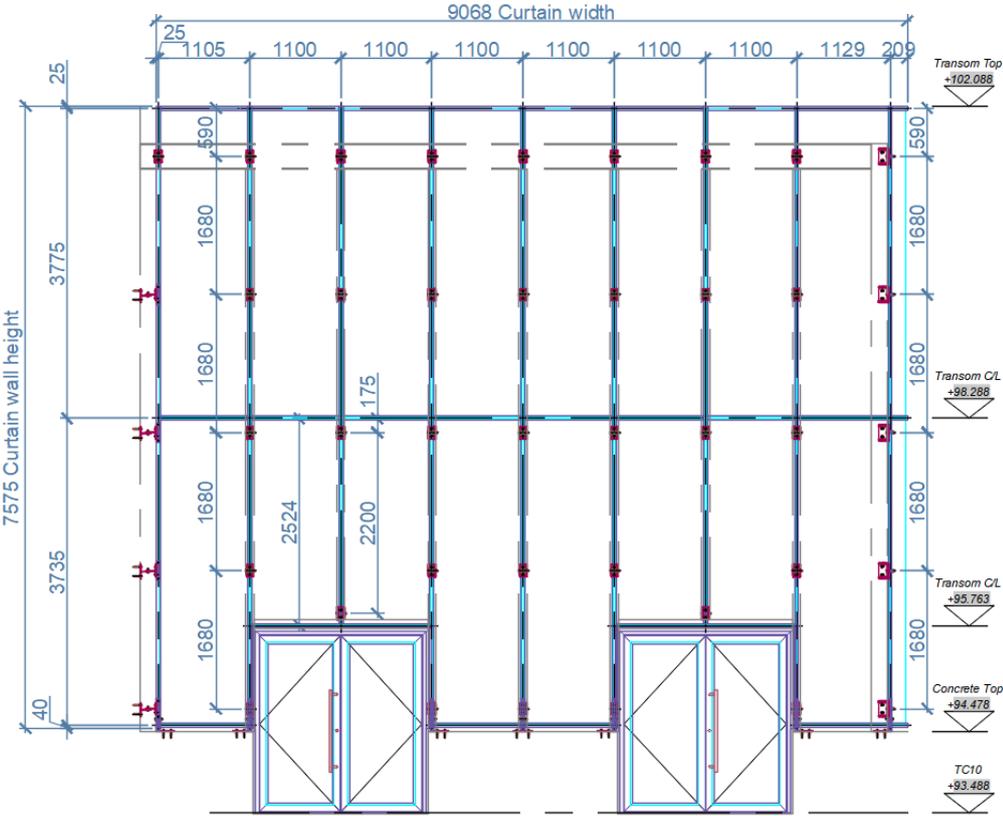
Curtain wall 23-08 Elevation A drawing
